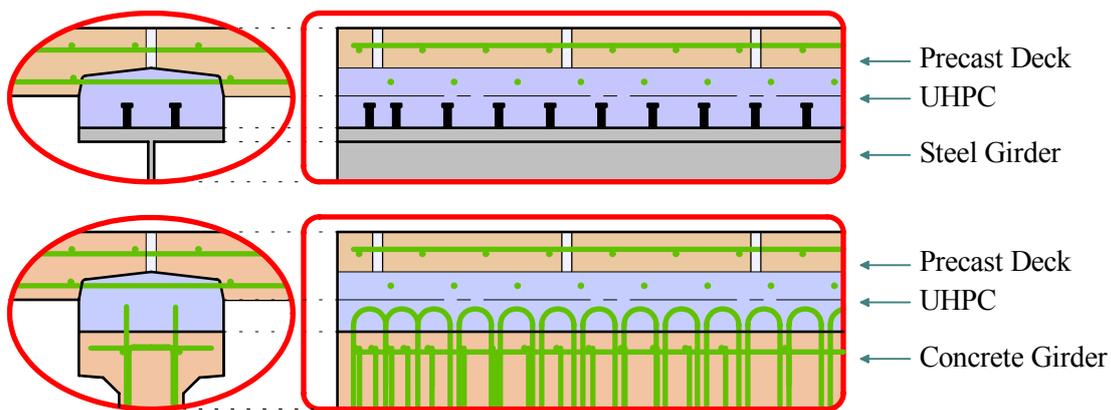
Field-Cast UHPC Composite Connection Detail for Precast Bridge Deck Panels
